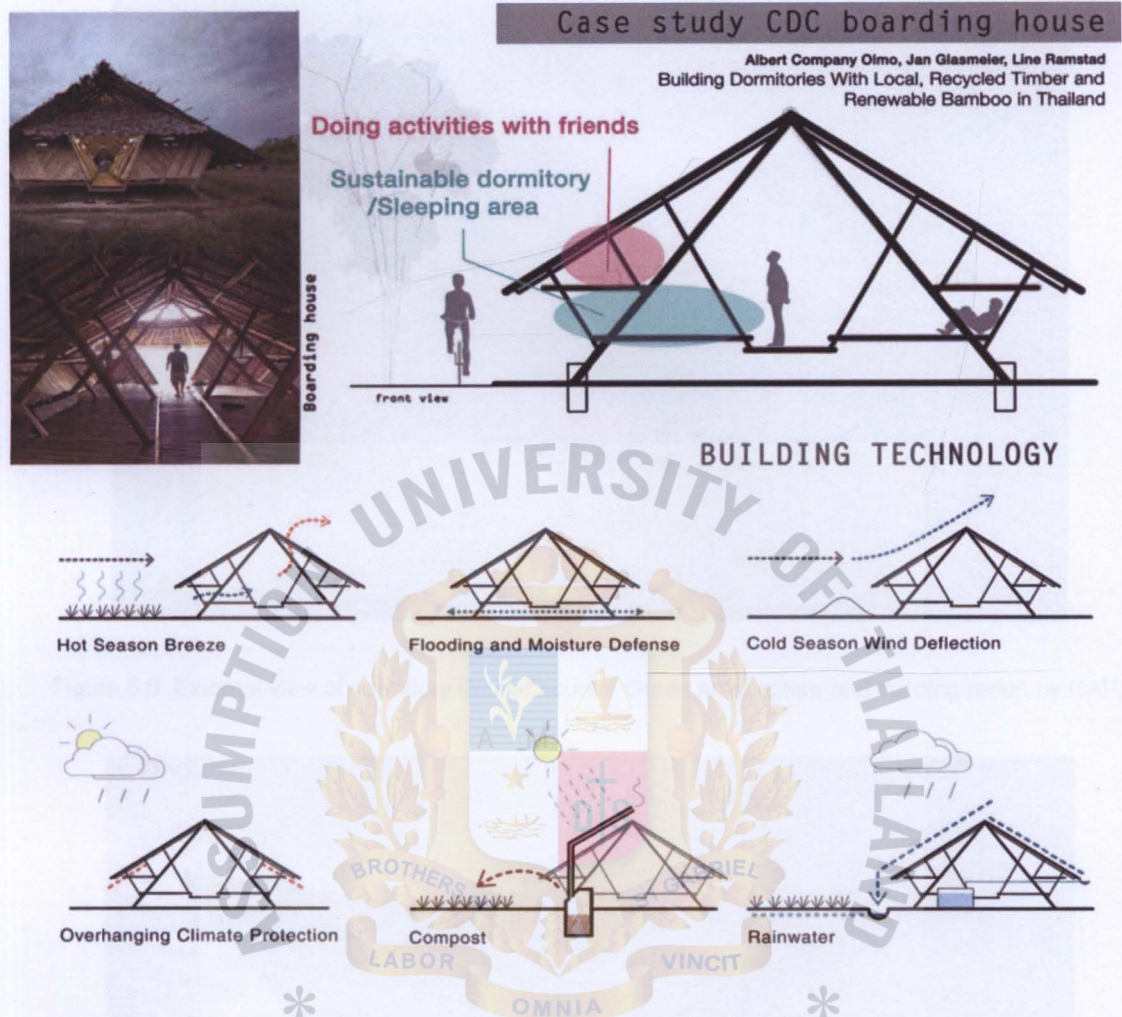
Building technology of CDC boarding house (Image source: Green architecture and building report by GAP)
